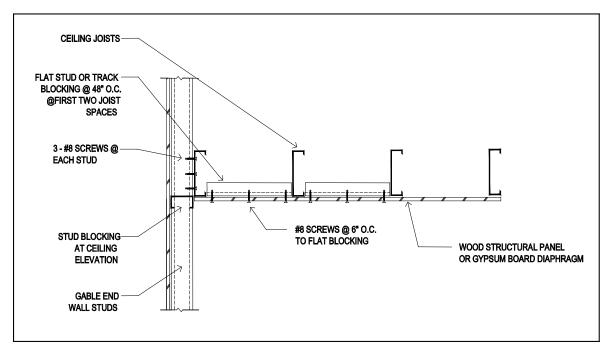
Ceiling Diaphragm to Gable Endwall Detail
